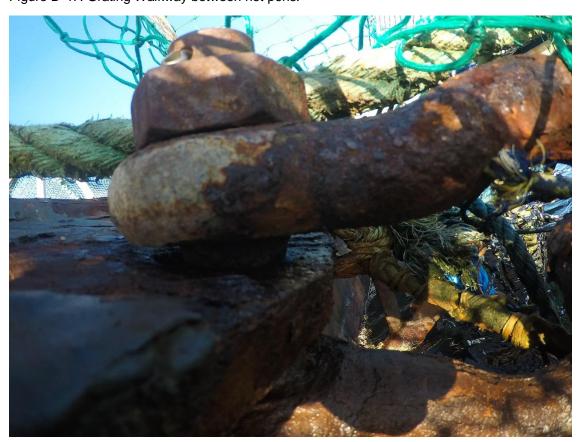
Rusted Anchor Shackle at Anchor 13. Note Reduced Edge Bolt Hole on Mooring Bracket.
